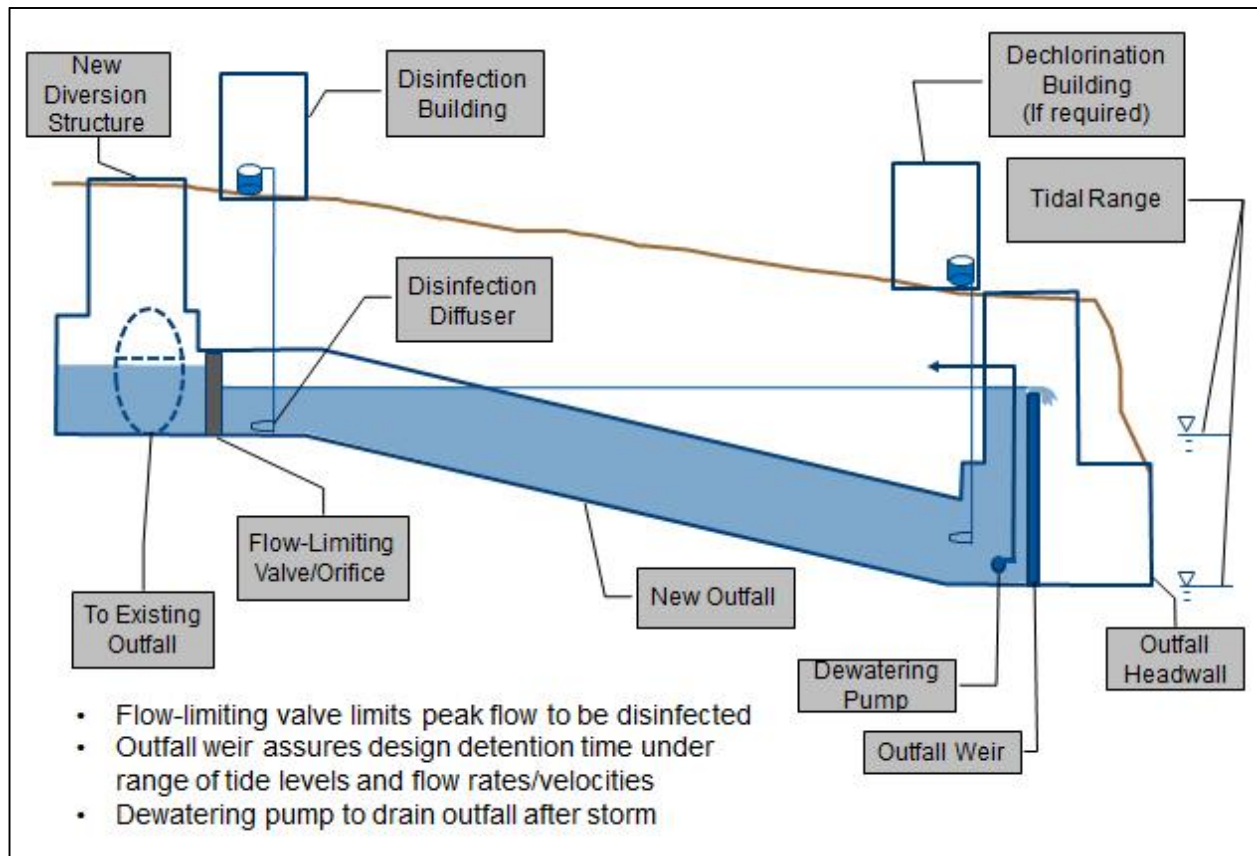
Typical Longitudinal Profile of Outfall Disinfection Control Measures
